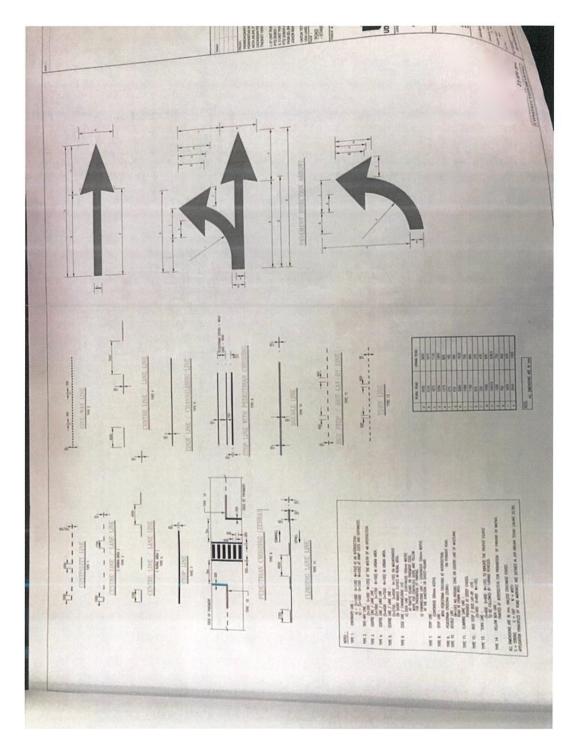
Shows the detail drawing for the road marking for Neuvo Centro 2 project
